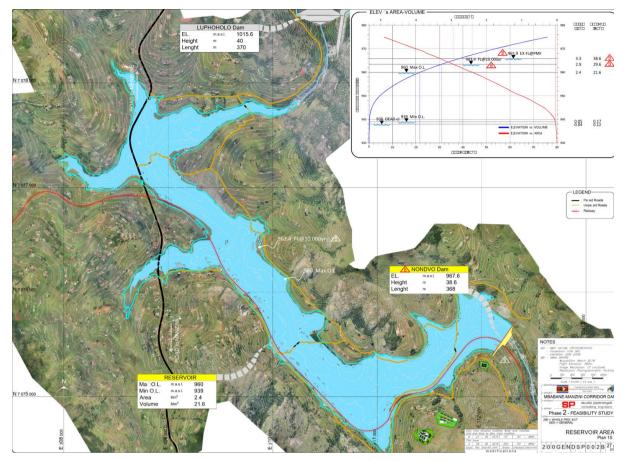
Nondvo Dam Layout – Design Drawing (Studio Pietrangeli, 2019)
